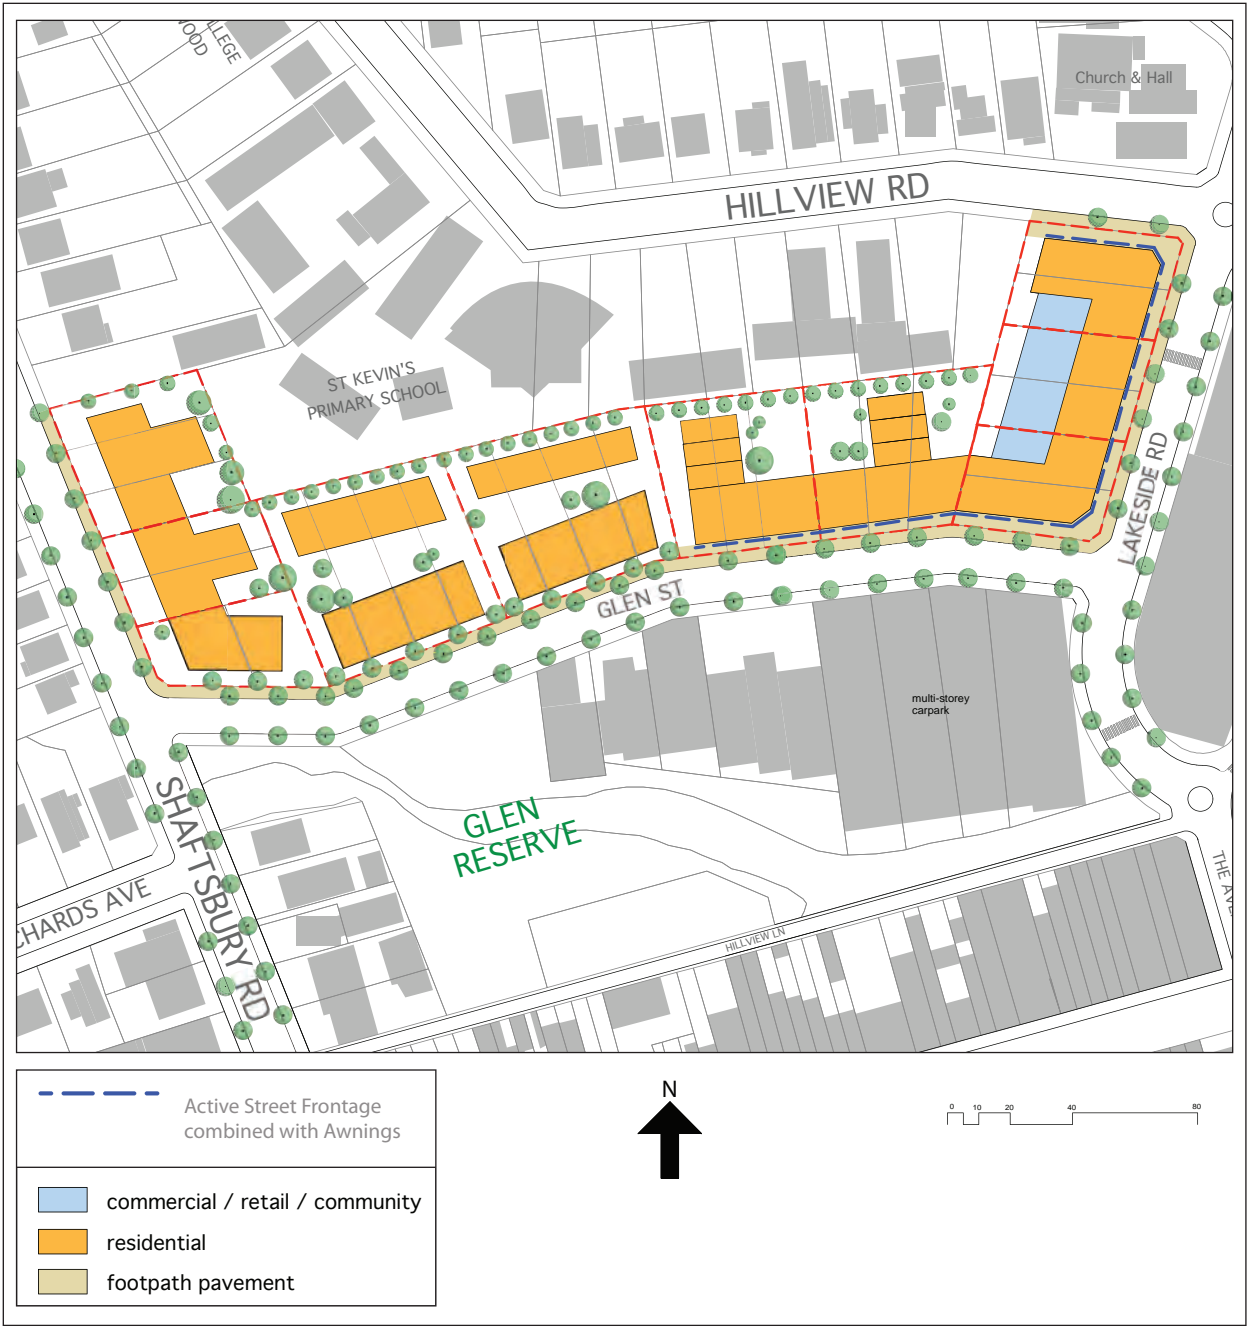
Glen Street and Lakeside Road Active Street Frontages Control Drawing.
